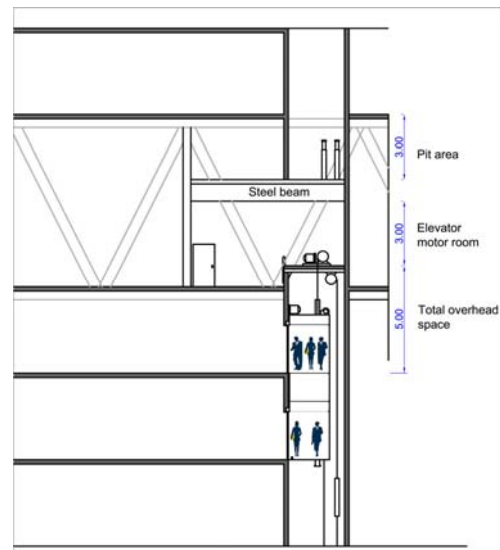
The upper zone pit area and the lower zone elevator machine room within the horizontal double-layer space structure
